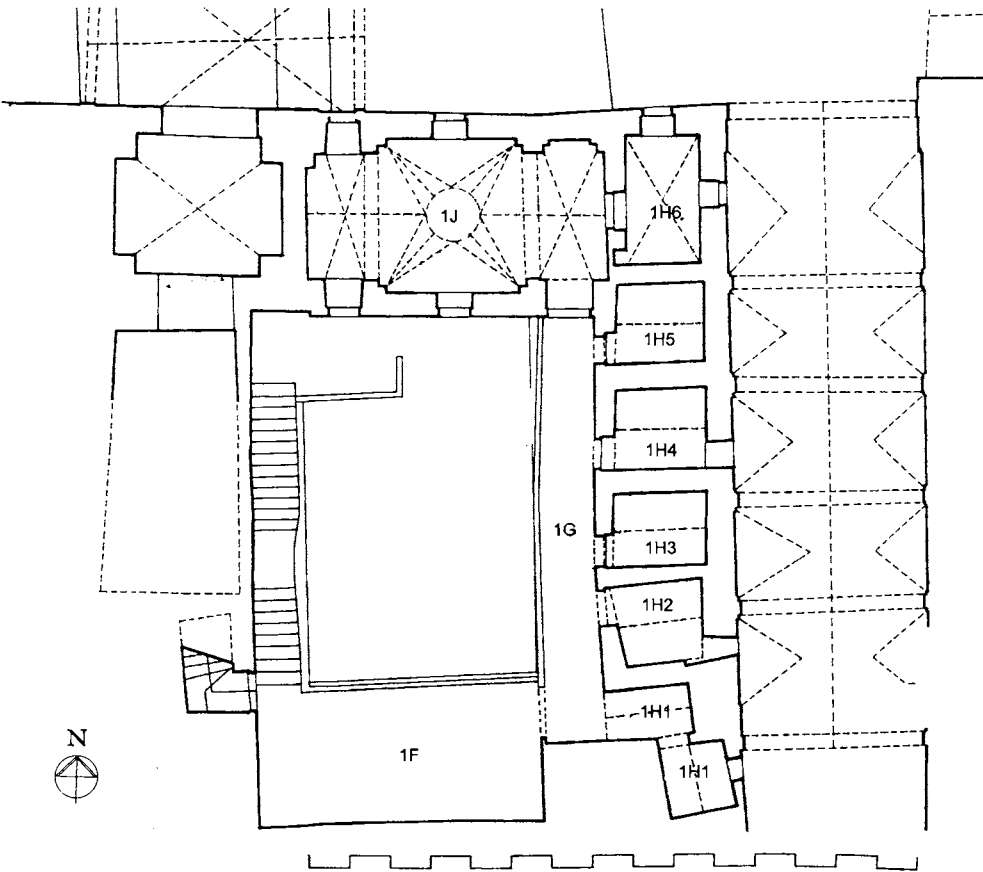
Ribat Bairam Jawish, first floor plan.
